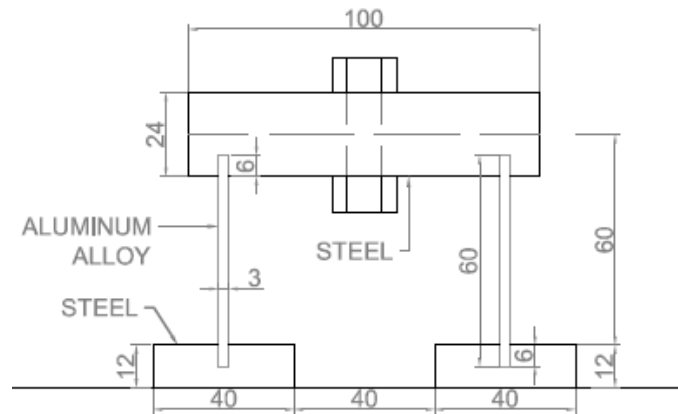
Structural elevation of short period structure (dimensions in mm at model scale)
